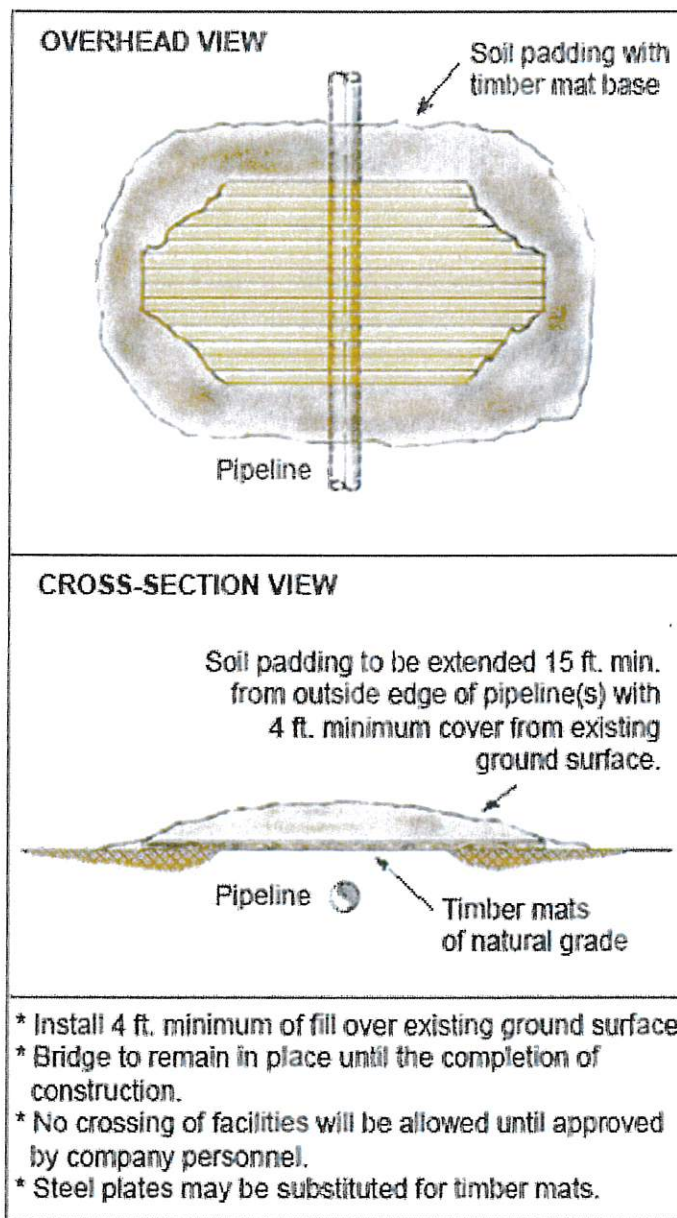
REQUIREMENTS FOR HEAVY EQUIPMENT CROSSING A PIPELINE.
